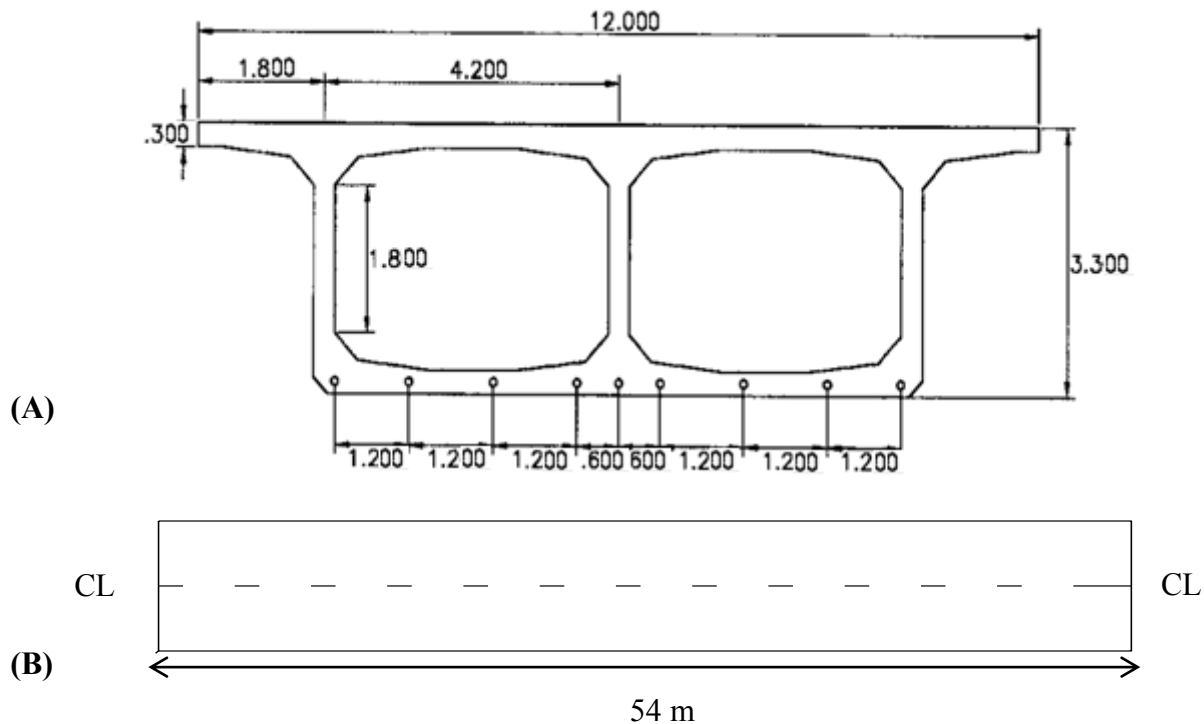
Geometry of curved bridge: (A) cross section and tendon position (B) plan view (all dimensions are in metres).
